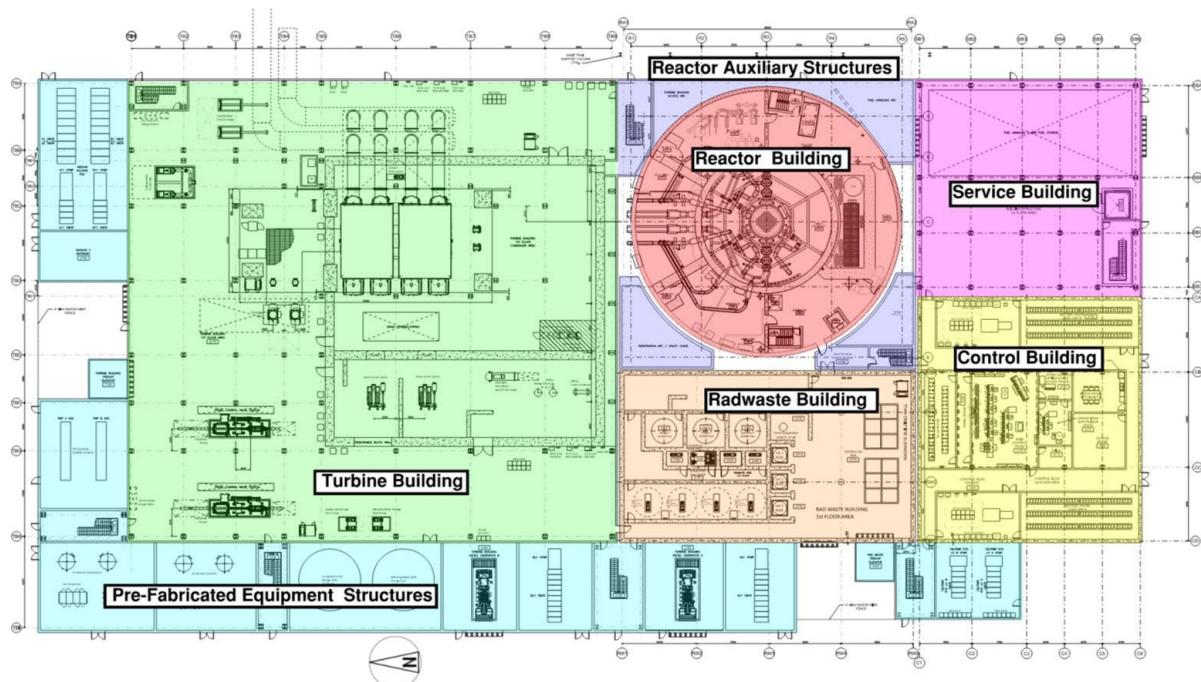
BWRX-300 Plant Power Block Building Boundaries Plan
